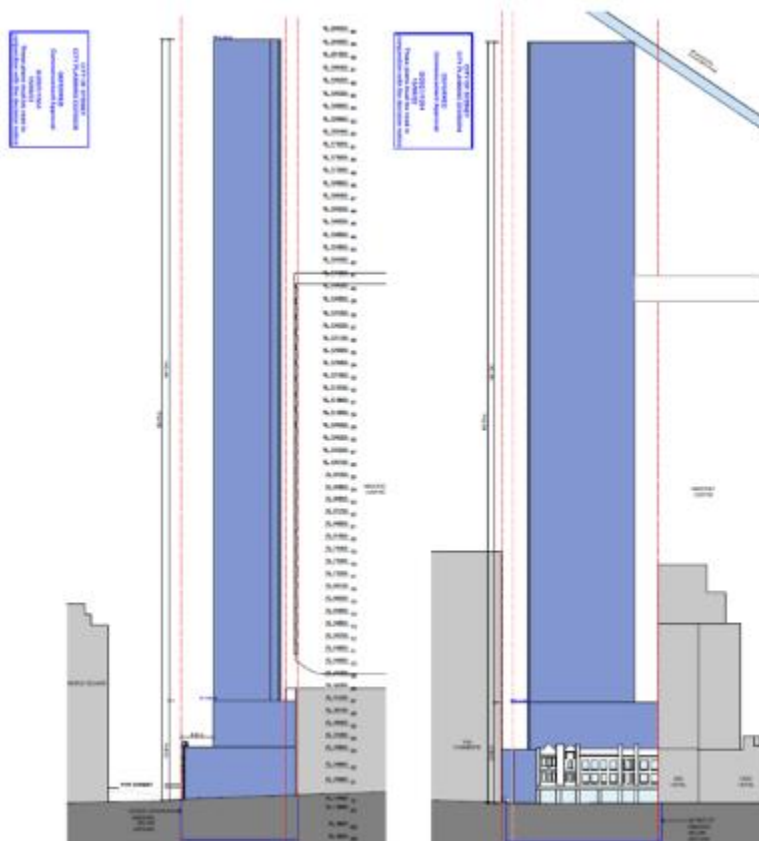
Approved concept envelope plans D/2021/1504 - south (left) and west (right) elevations
